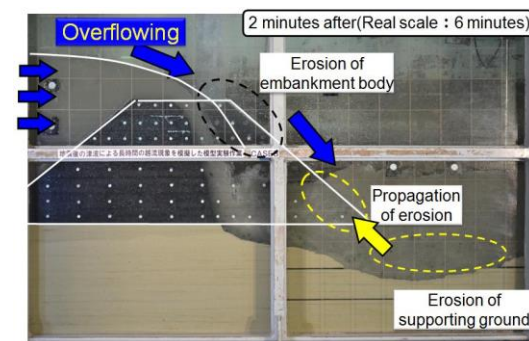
Overflowing model test on conventional railway embankment (2 minutes from the start of overflowing)
